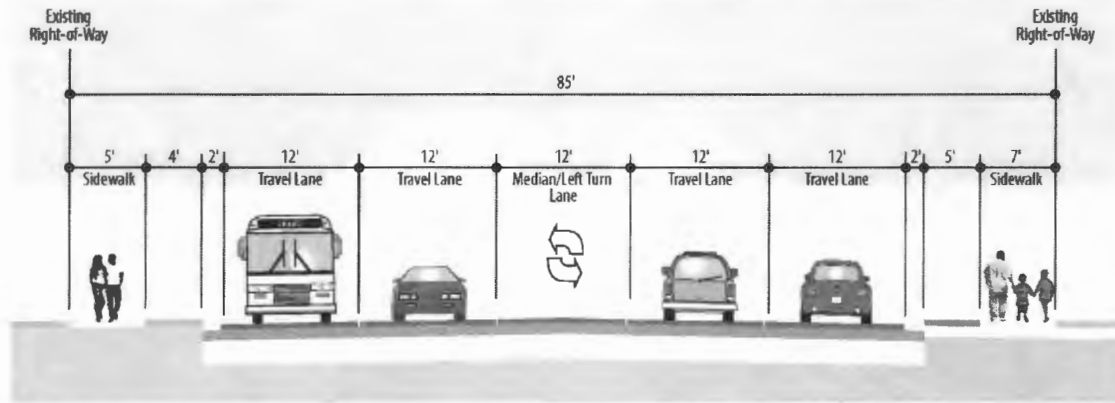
No Build Alternative Typical Section: Silver Star Road to Bonnie Brae Circle
